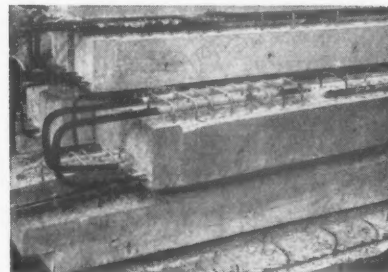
Precast beams awaiting erection. John Laing & Son, Ltd.
